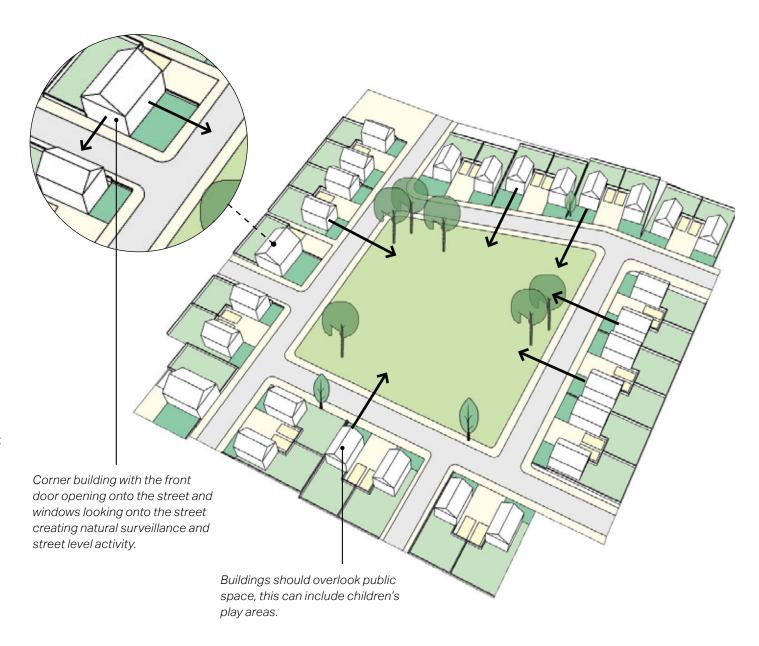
Diagram showing buildings fronting onto public space and corner buildings.
